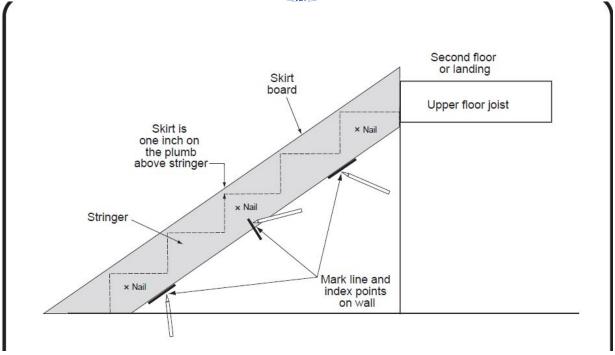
Marking wall skirt in place (index points on wall and skirt).
